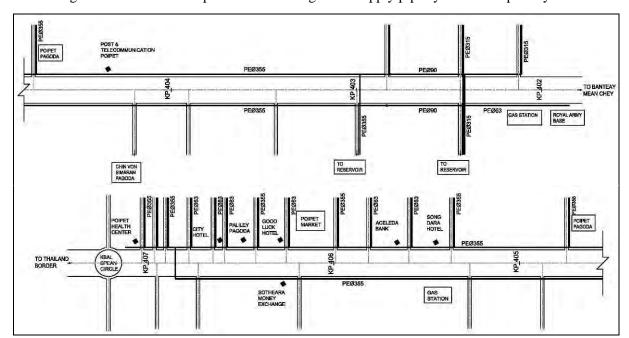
shows the plan of the existing water supply pipe system in Poipet city.
